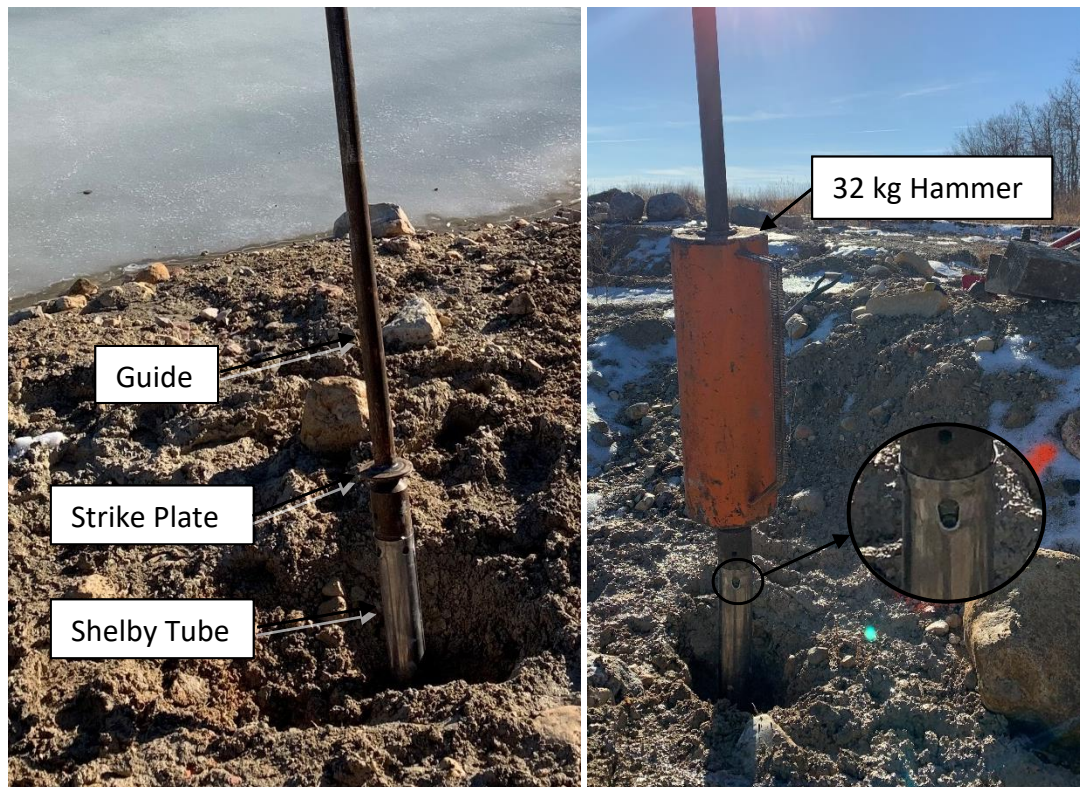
Shelby tube with guide attached (left) and Shelby tube with guide attached and hammer (right), showing yielded steel at holes
